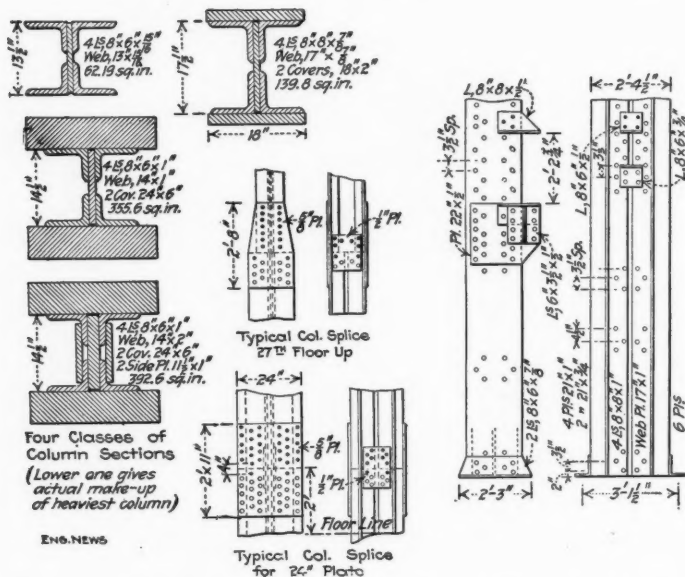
TYPES OF COLUMN SECTION, EQUITABLE BUILDING
